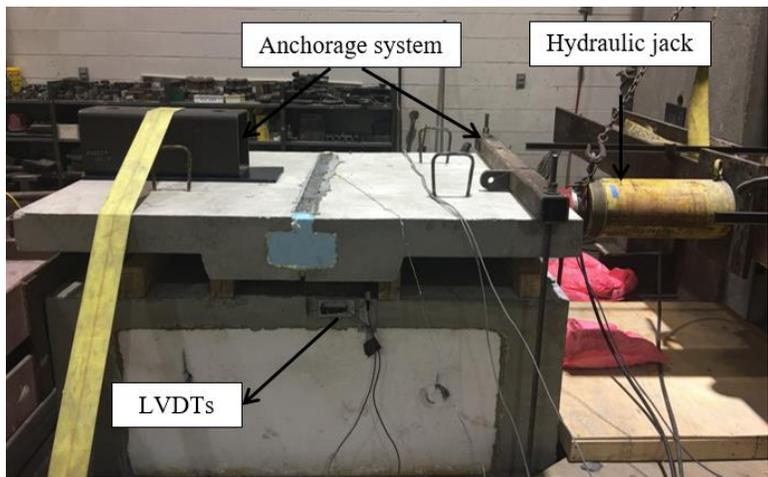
Push-off Test Setup for Concrete Girder Specimens
